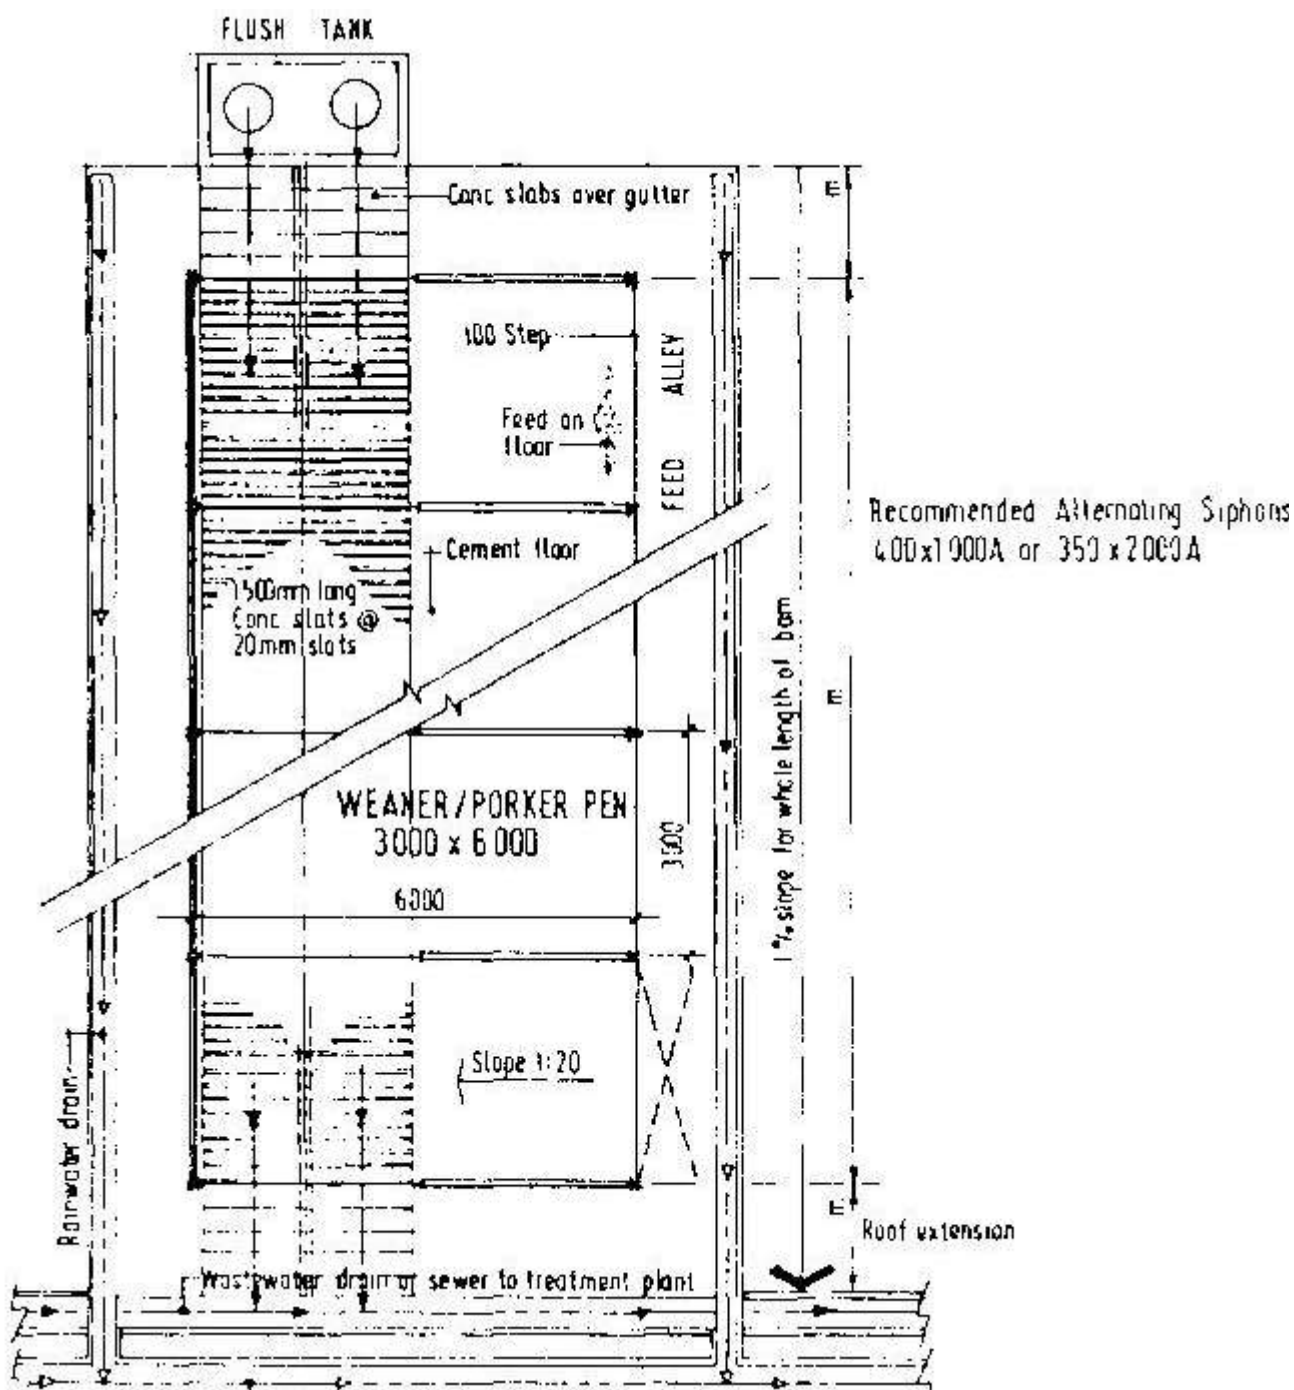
Weaner-grower-porker barn with sloped floor (all dimensions are in millimetres, except as indicated). Grower pens should have 0.5 m² of floor space per pig. For good performance, and to discourage such problems as tail biting, no more than 25 pigs should be put in one pen.
